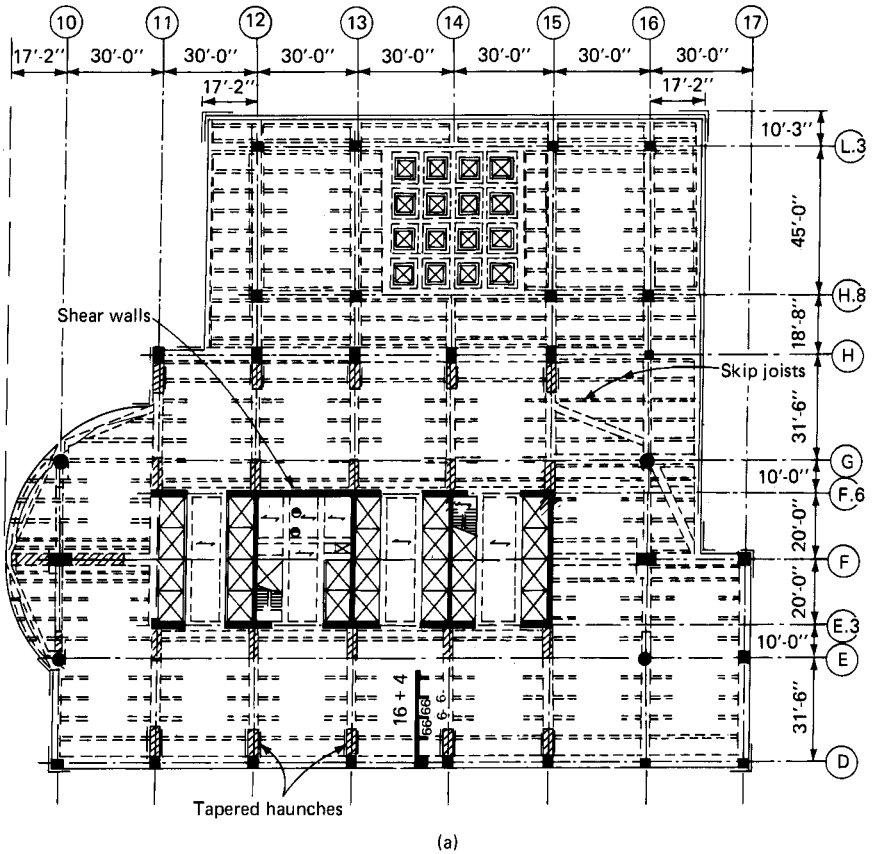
Example of shear wall–frame interaction in a 50-story building. (a) Levels 2 through 14 floor plan;
